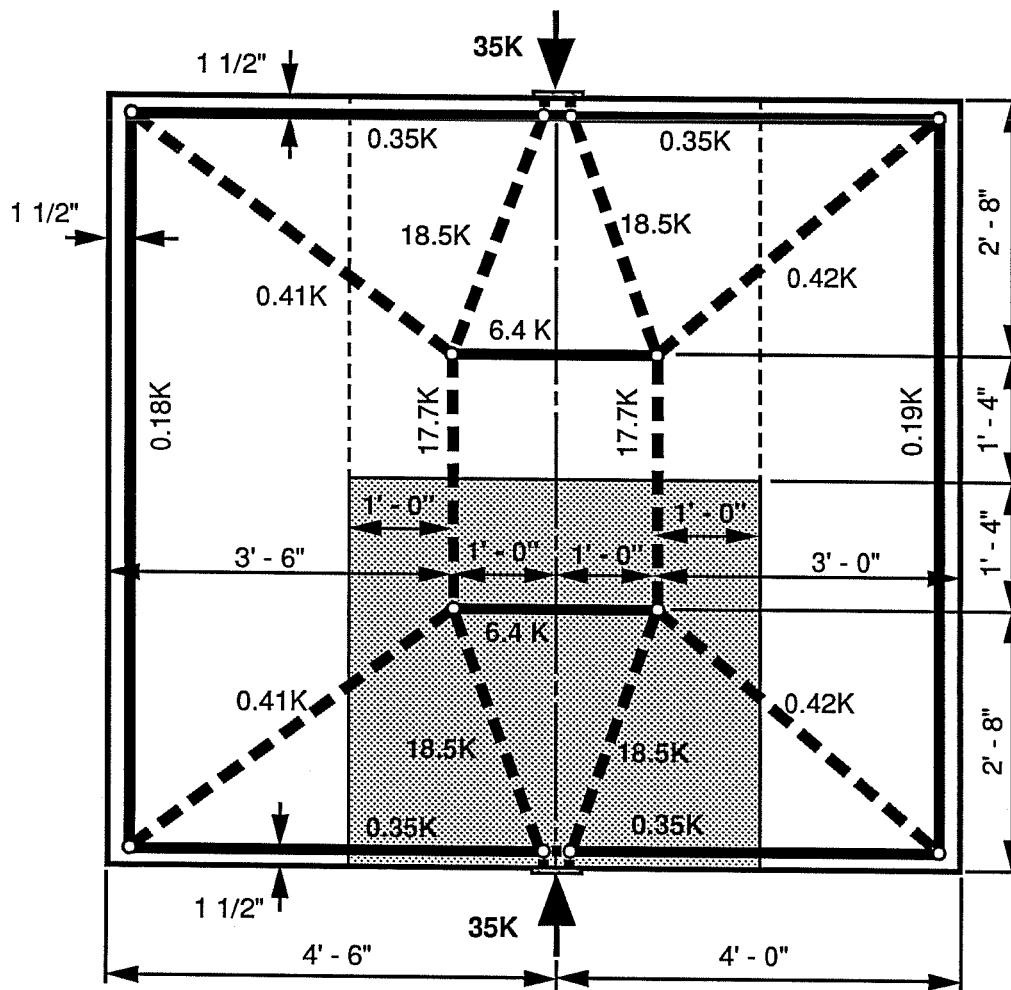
Horizontal Plane Strut-and-Tie Model #4 for Load on an Interior Anchor
